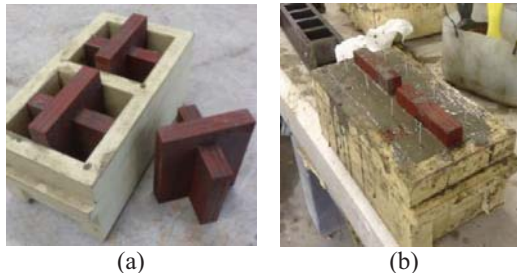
(a) Specimens' moulds (b) Cast specimens showing inserted fibres
